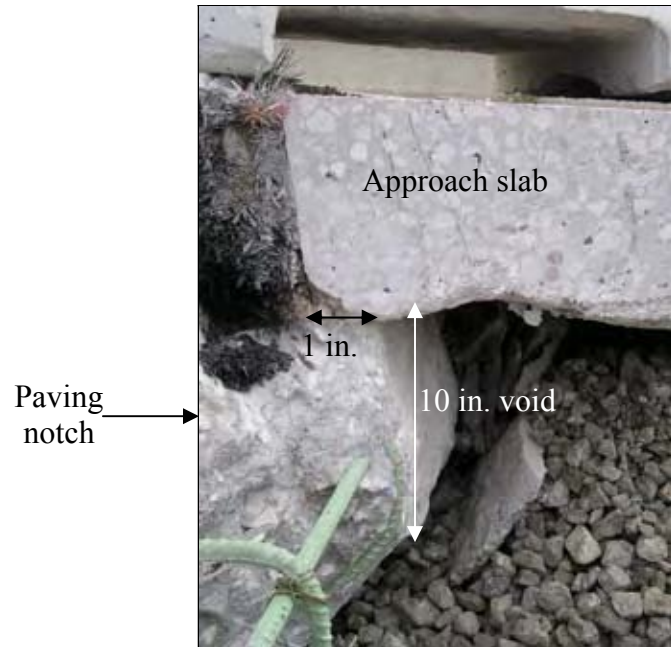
Approach slab resting on 1 inch of the paving notch, and a 10-inch-void developed under the approach slab (South end of SBL)
